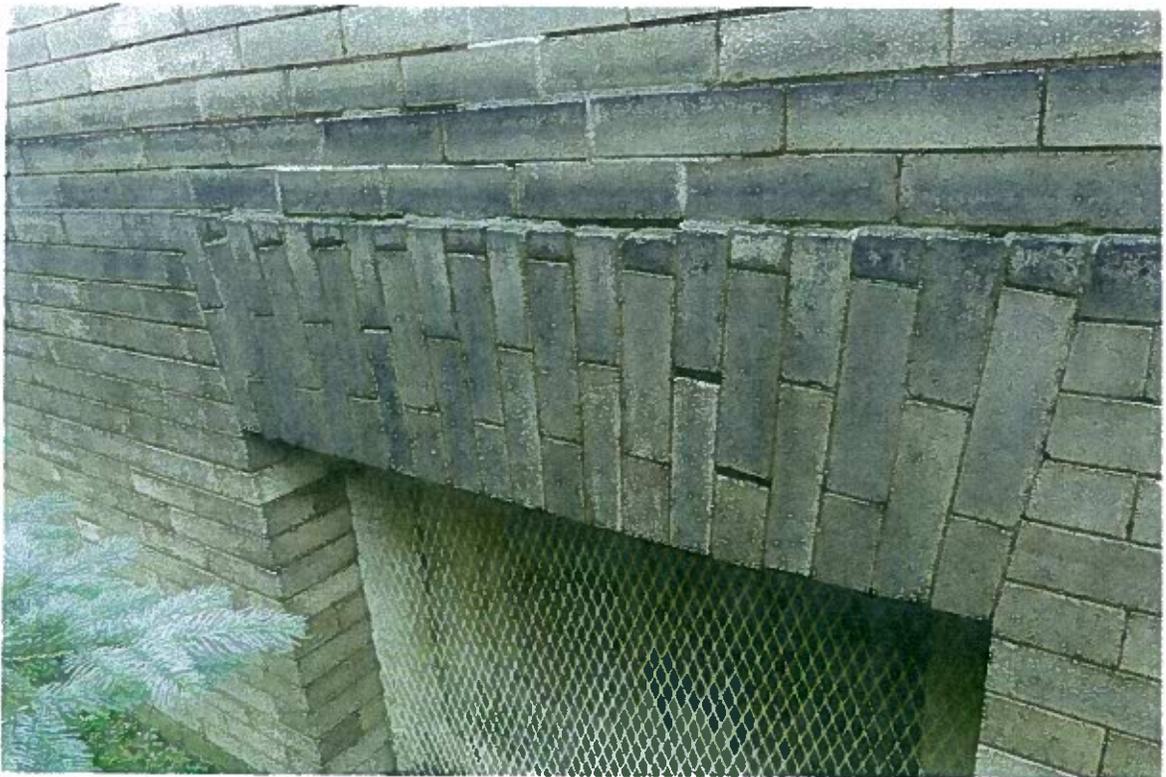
Deterioration of mortar at jack arch over basement window. Brick is slipping out of place.
